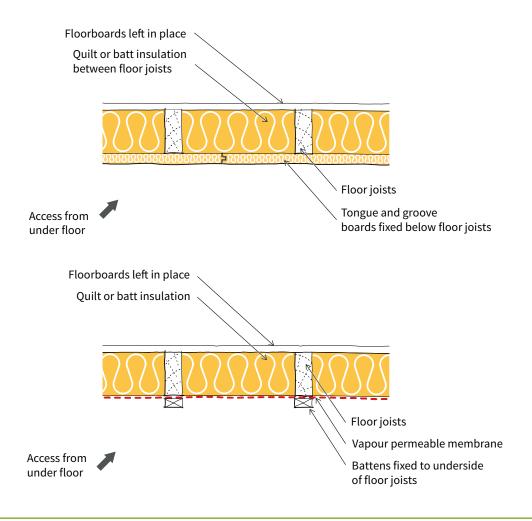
(top): fixing insulation from below floor If access can be achieved from below the floor then installation can be much easier to achieve in that the floorboards do not need to be removed. Here insulation is held in place with tongue and grooved wood-fibre board which will give a good airtight seal. A variety of insulation materials can be used in this situation. Ideally these should be vapour permeable such as wood-fibre, compressed hemp, sheep's wool.
